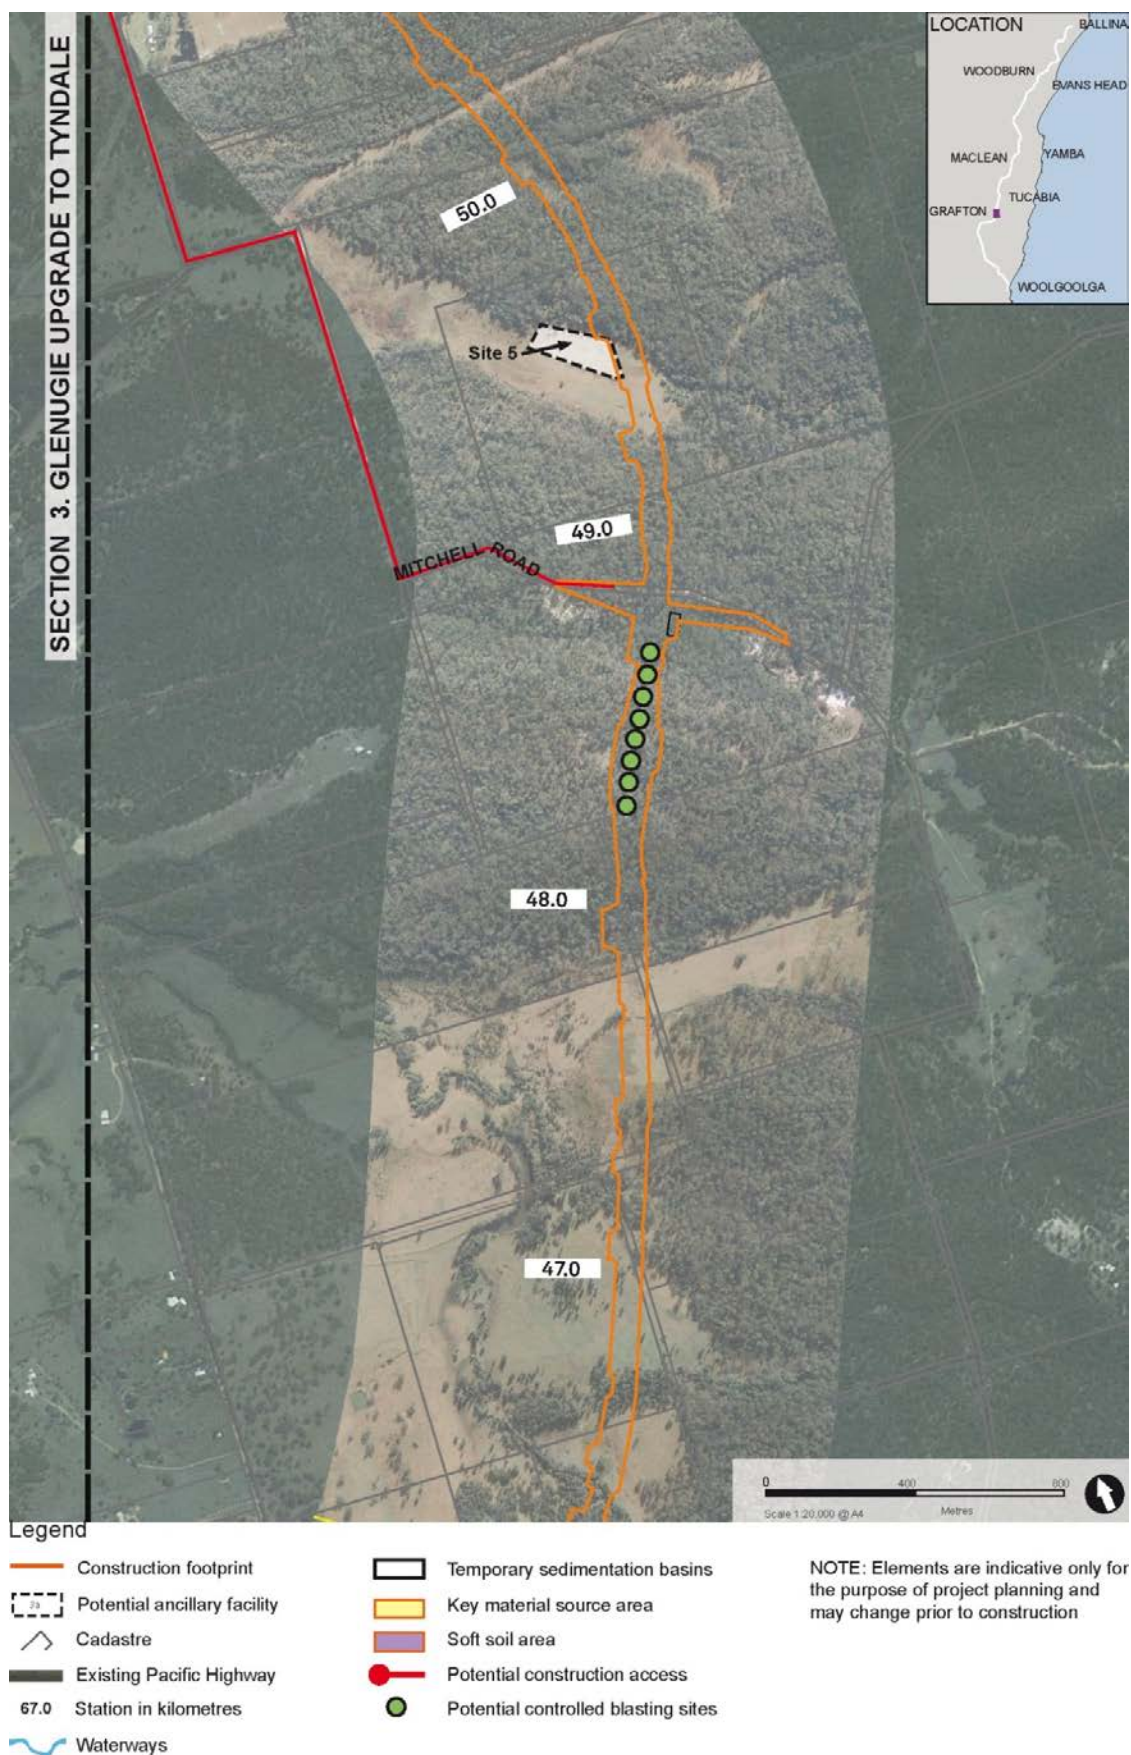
Extent of construction and construction features Section 3 (Station 46.6 to 50.6)
